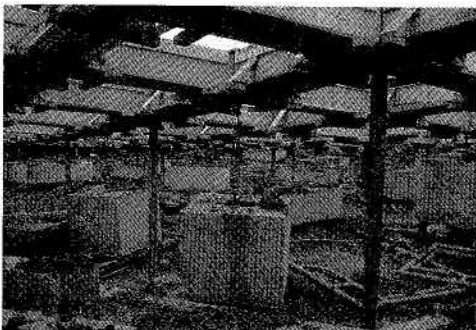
(b) Concrete blocks suspended just above concrete floor slab
